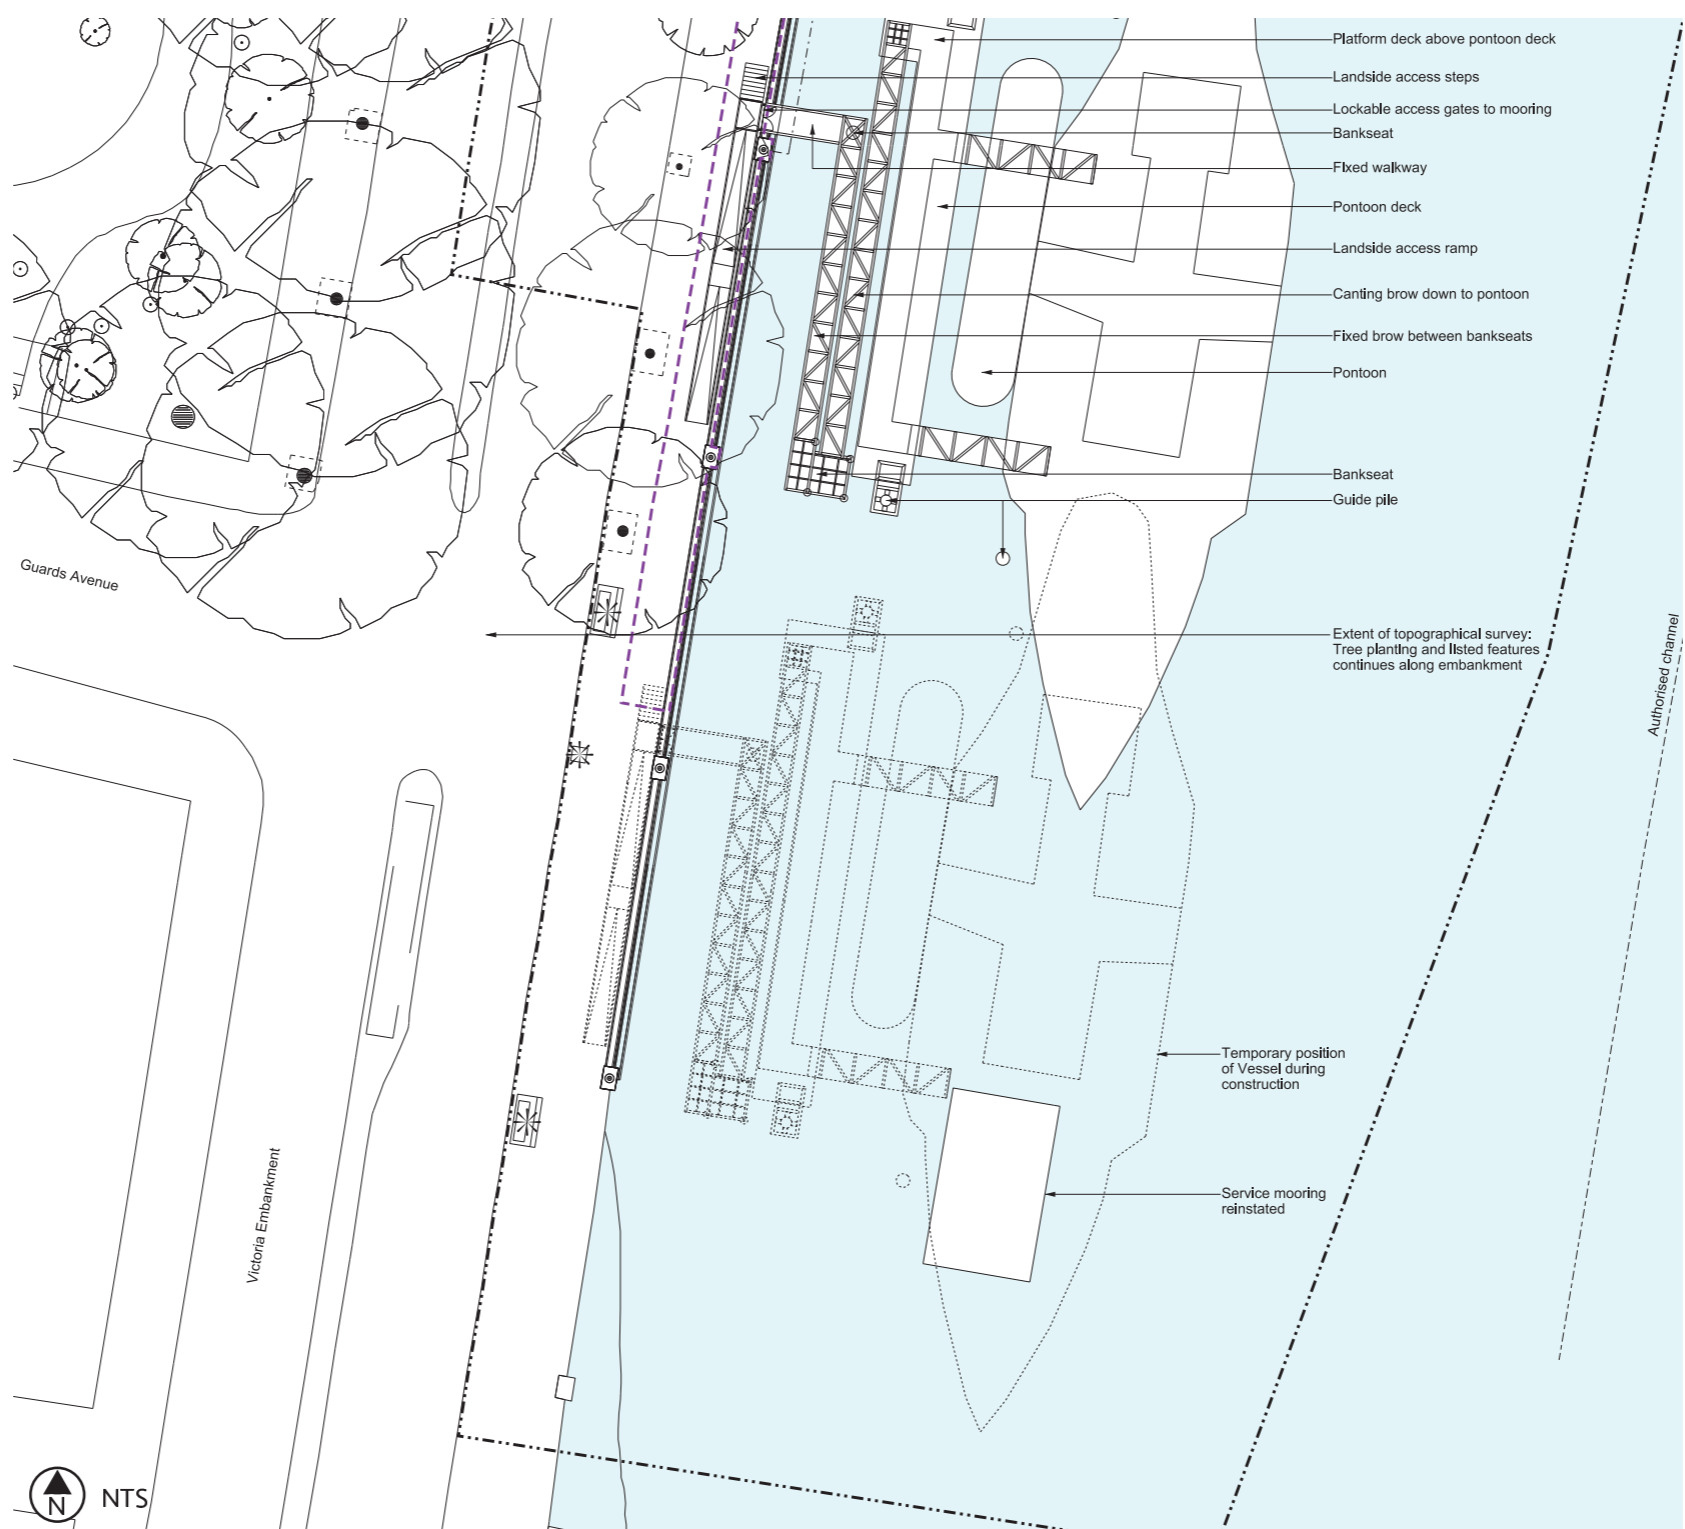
Proposed mooring access details - refer to Proposed landscape plan sheet 2 of 2 in the *Book of Plans
